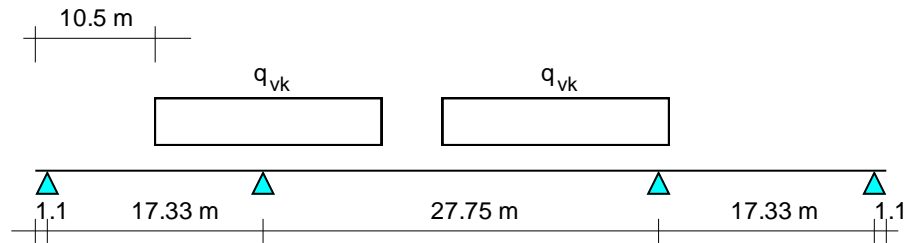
SW/2 arrangement for Load Step 6
